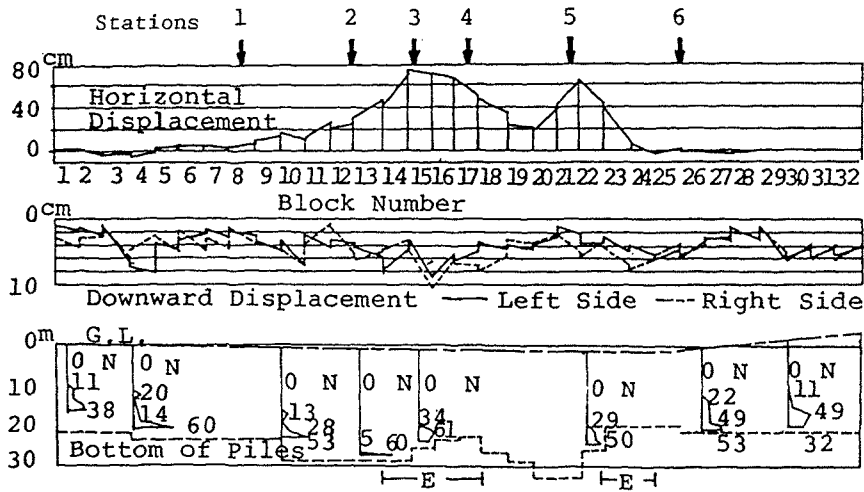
Damage of Anenuma Elevated Bridge by the 1968 Tokachi-oki Earthquake
